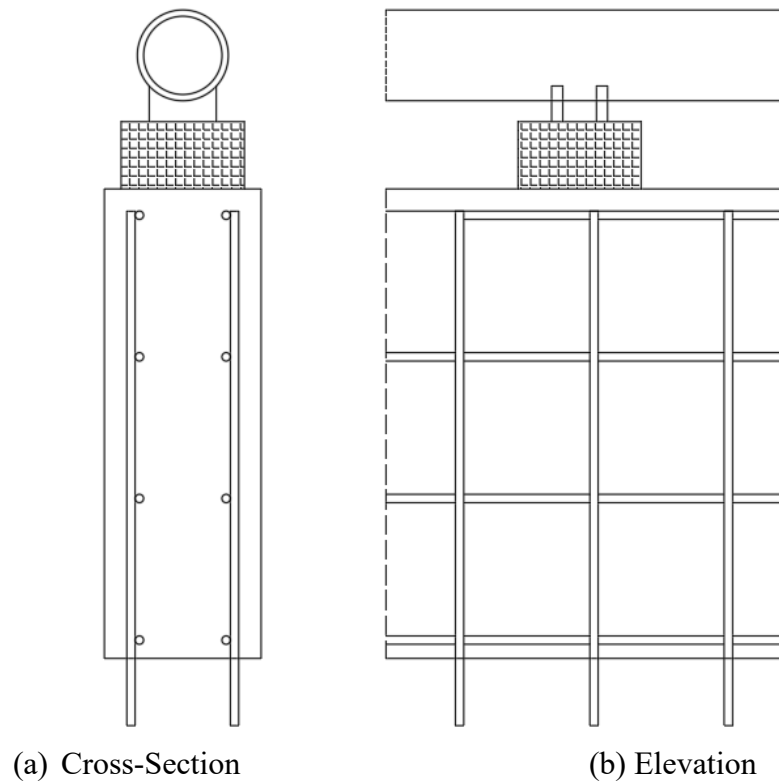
Concept 3 – Rigid Wall and Absorbing Steel Rail
